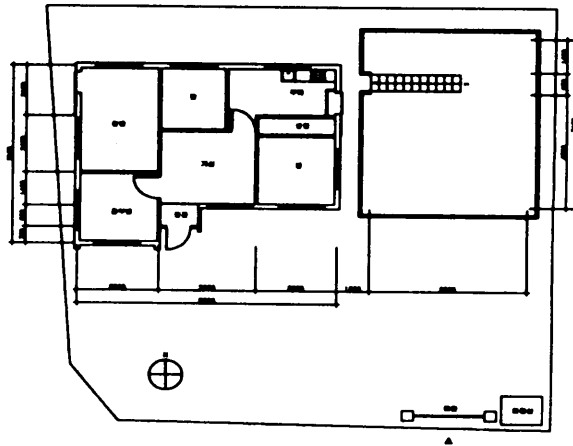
A 1st floor plan of house in improvement village (Located Sam-Yang-Dong)
